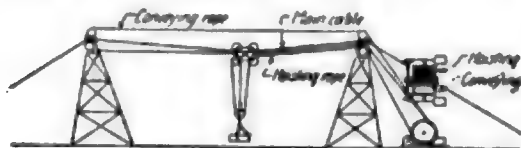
ARRANGEMENT OF LIDGERWOOD CABLEWAY.
